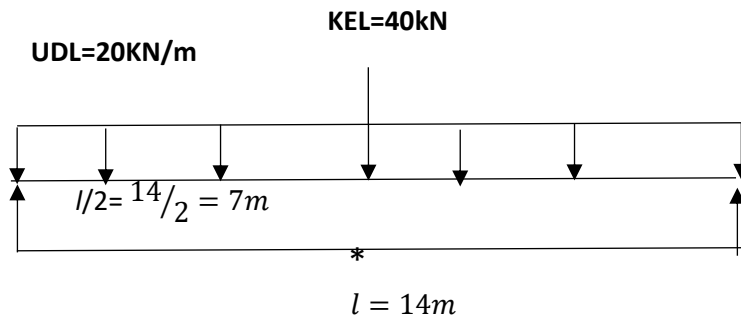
Sketch for Loading of Kyoho Bridge Beam
